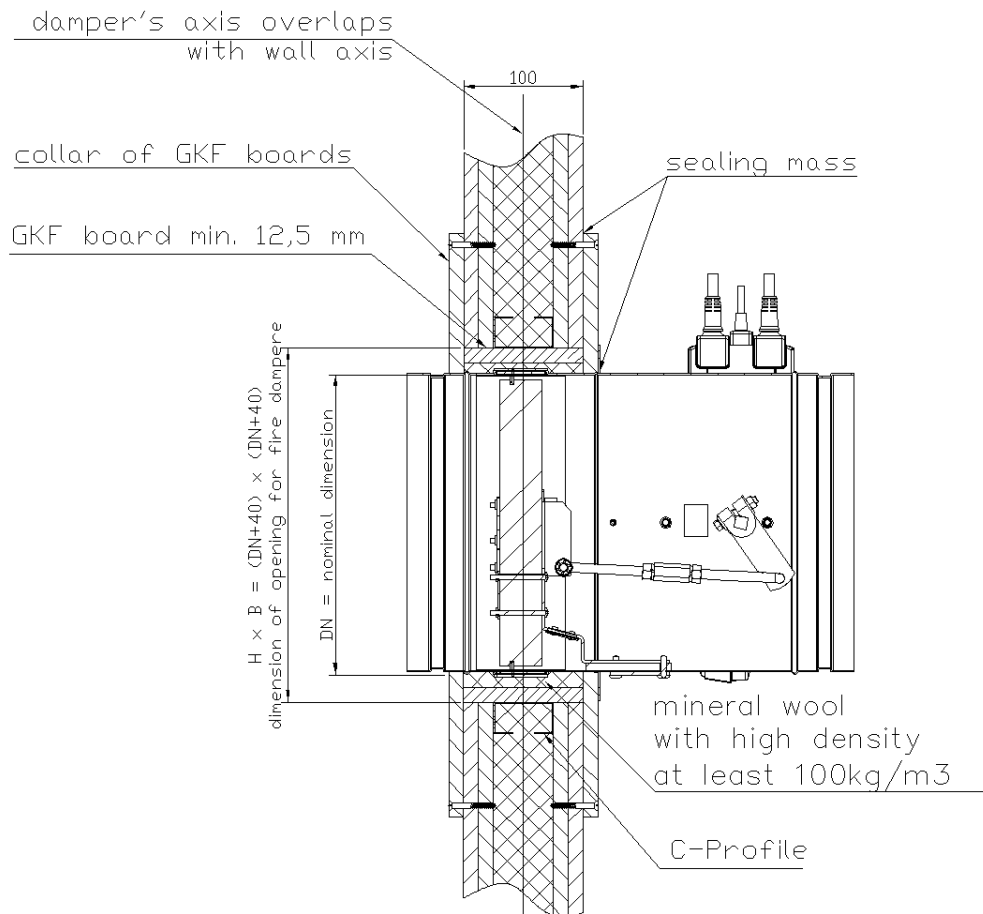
Installation method of fire dampers KTS-O in flexible wall with 100 mm thickness
